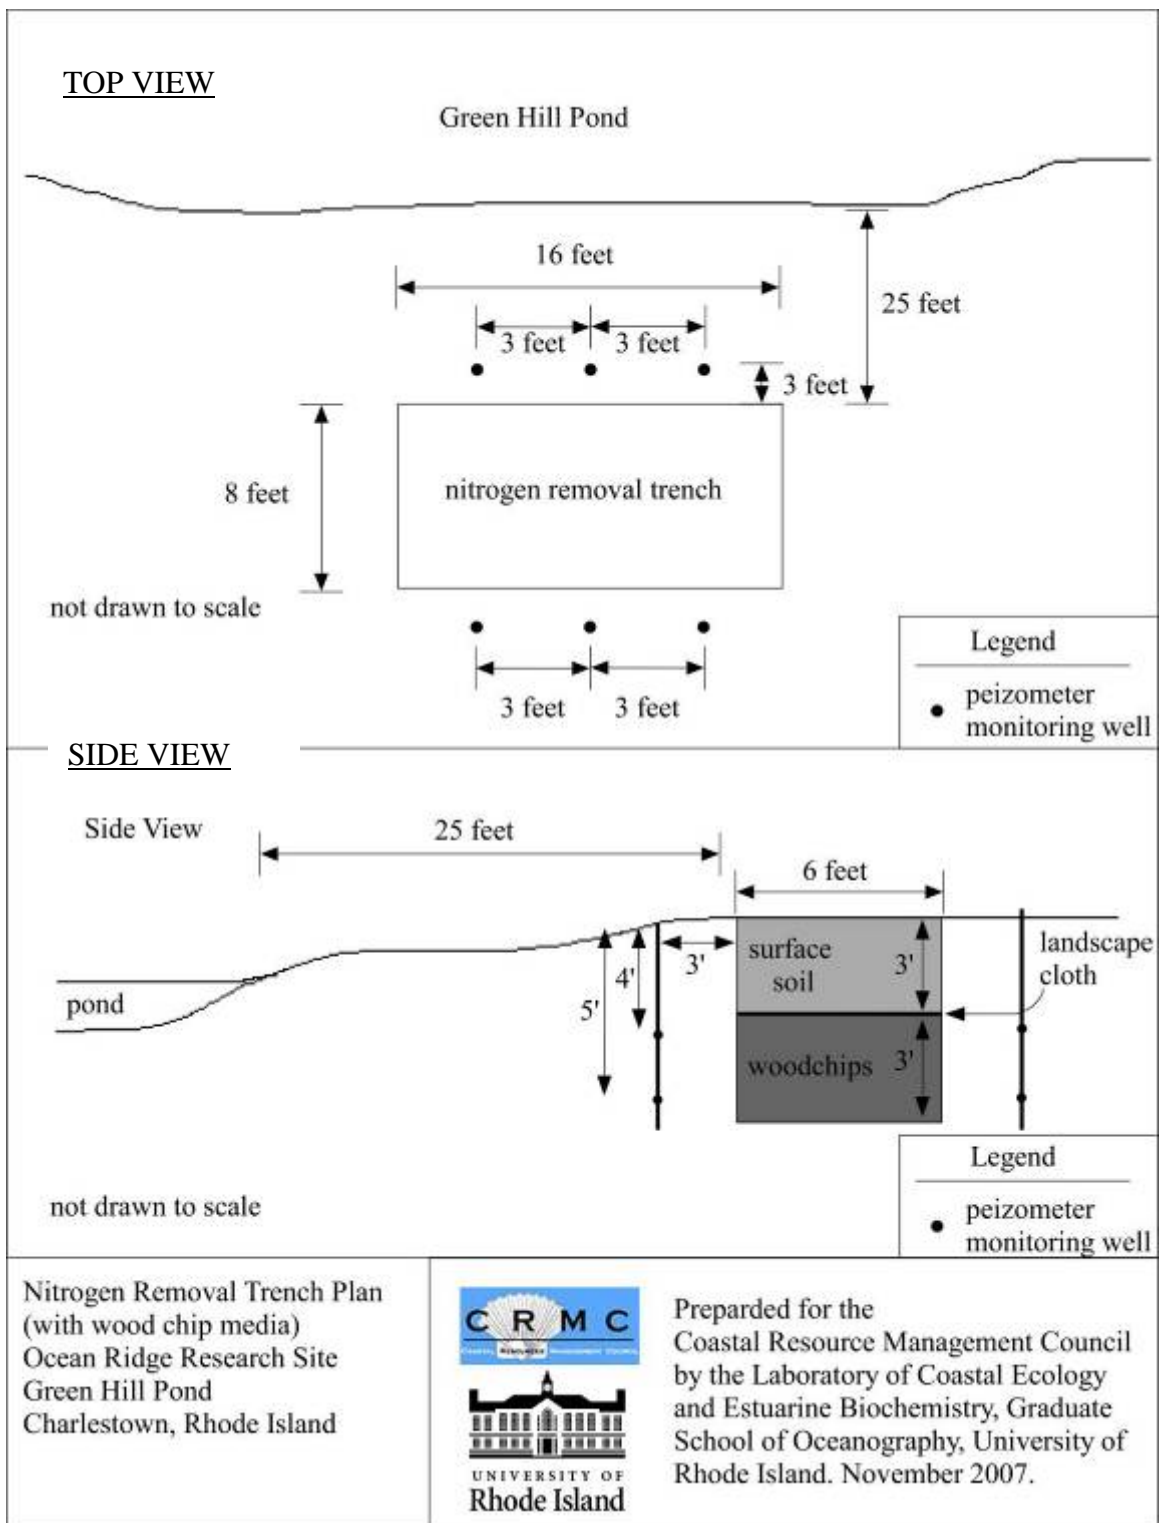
Site plan for a nitrogen removal trench using wood chips as a bacterial media. The plan was developed for a field test site located in Charlestown, Rhode Island.
